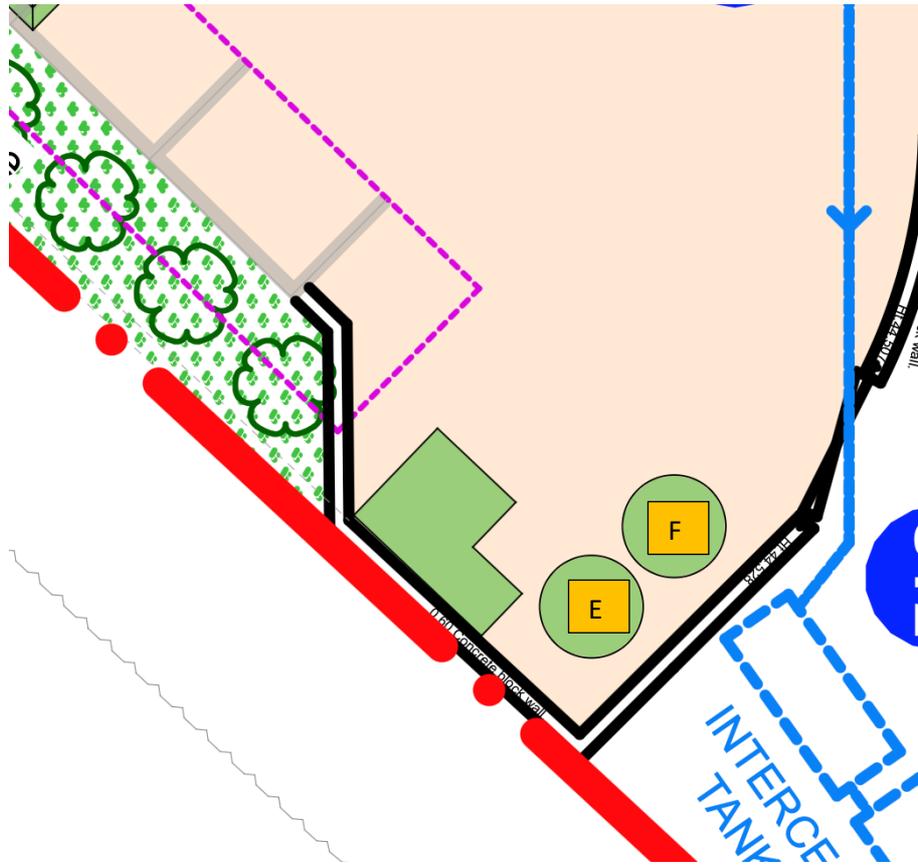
Snapshot taken from Drawing 100 Rev C Site Layout Plan showing position of Tanks E and F
